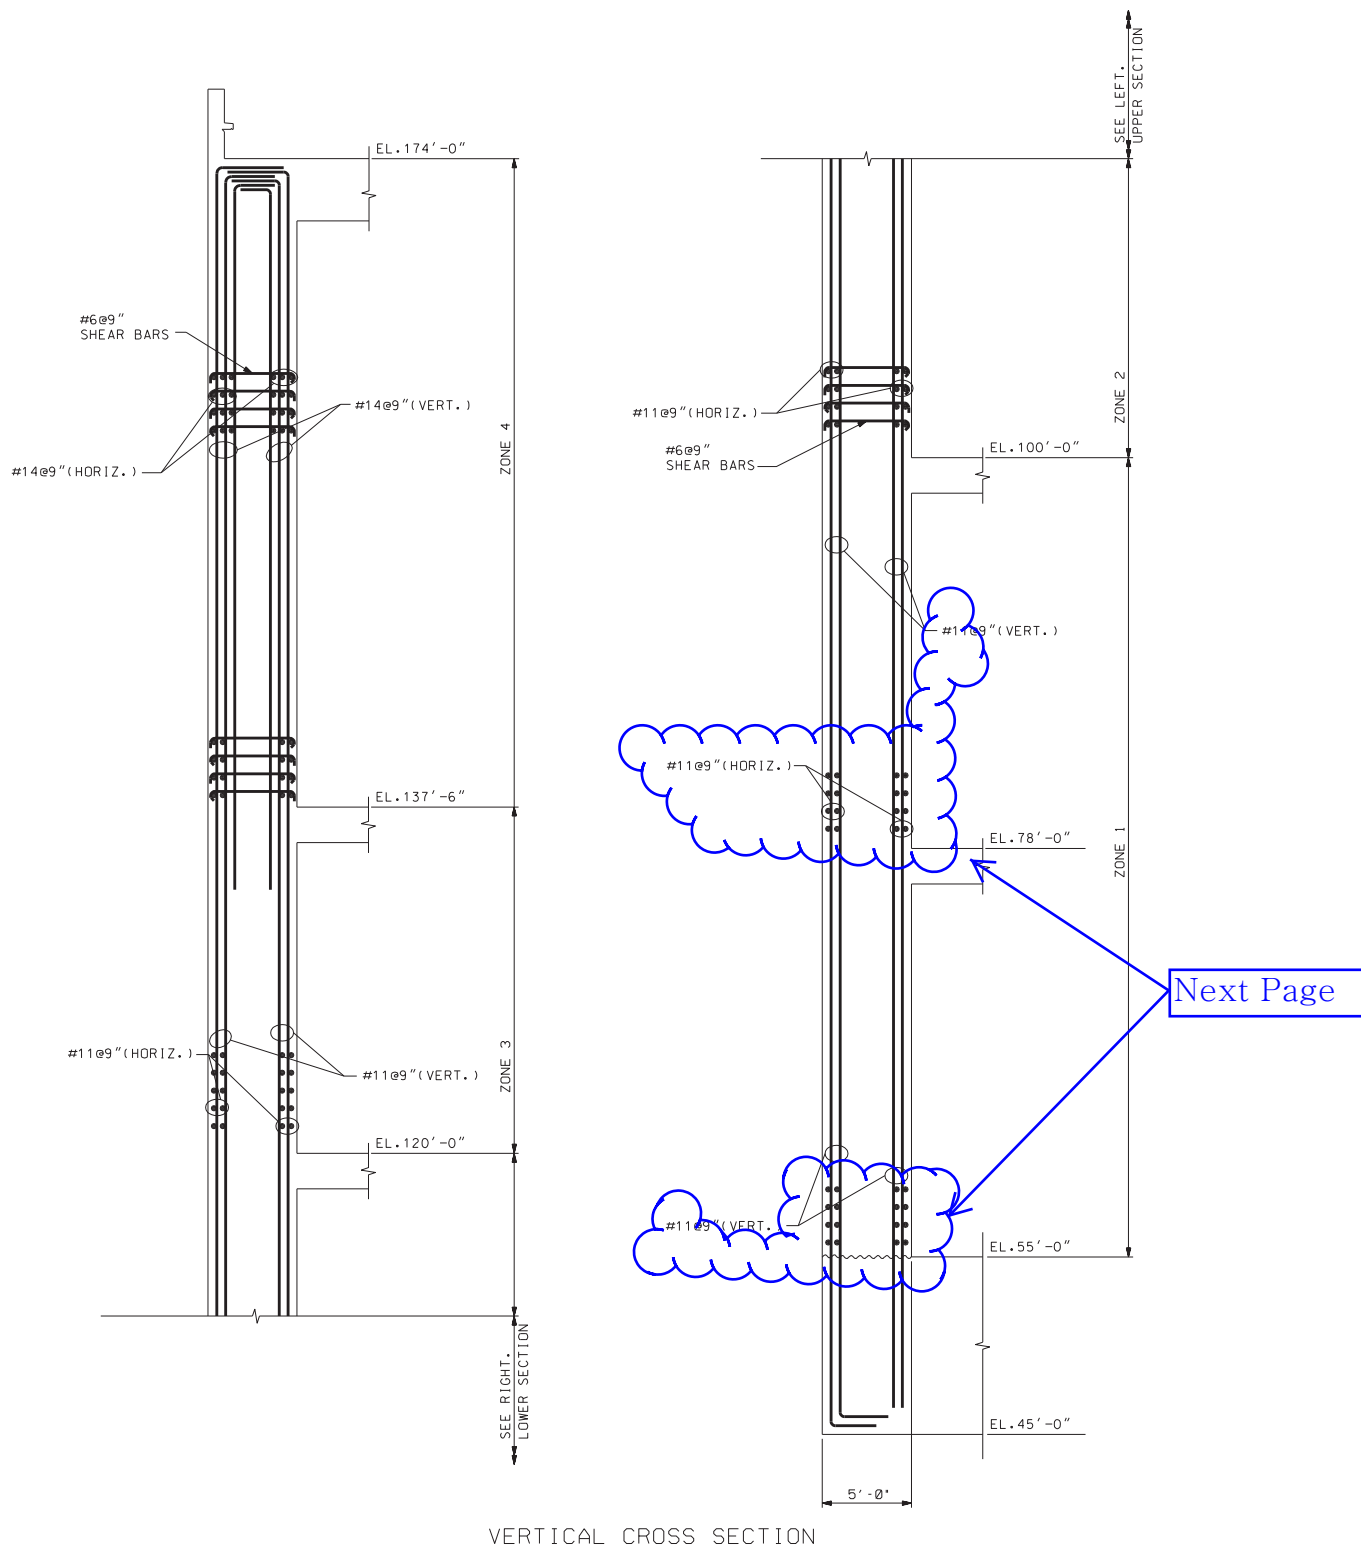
A-40 Reinforcement Arrangement of the AB MSIV House Wall (Section 1)
